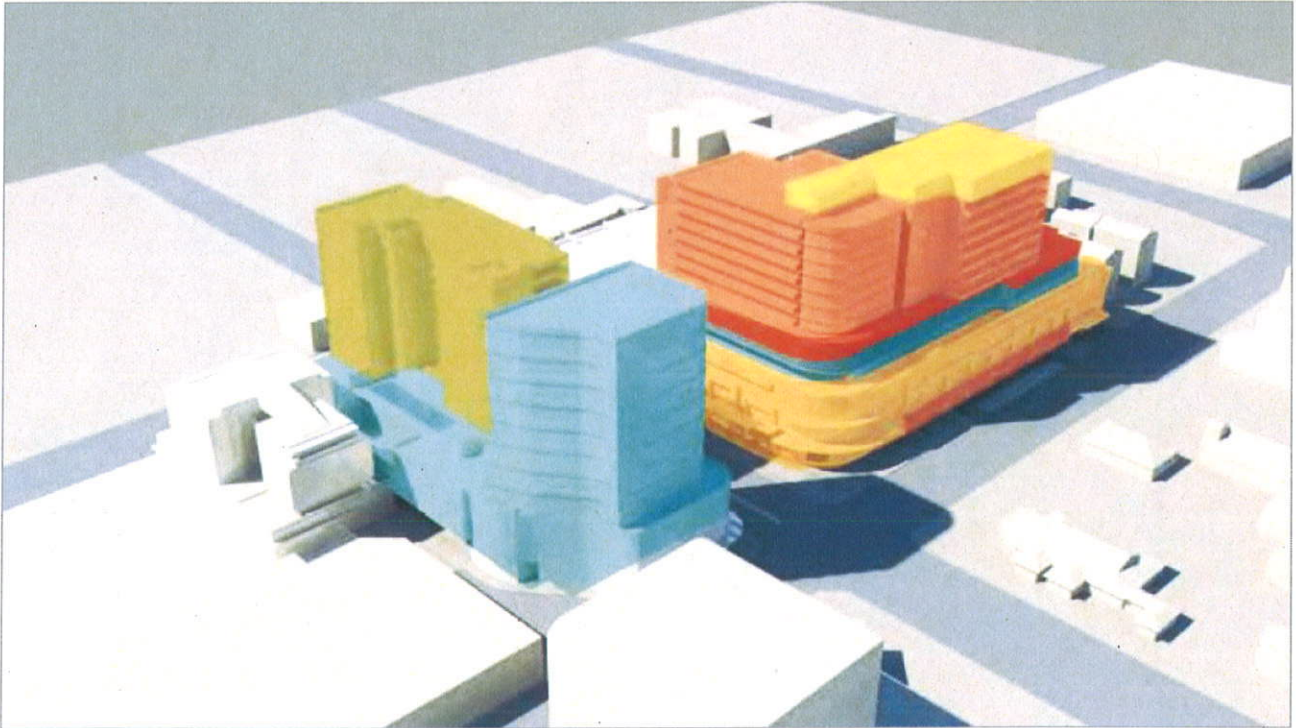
Proposed massing/building envelope viewed from the southwest. The intersection of Burelli Street and Corrimal Street is in the foreground.
